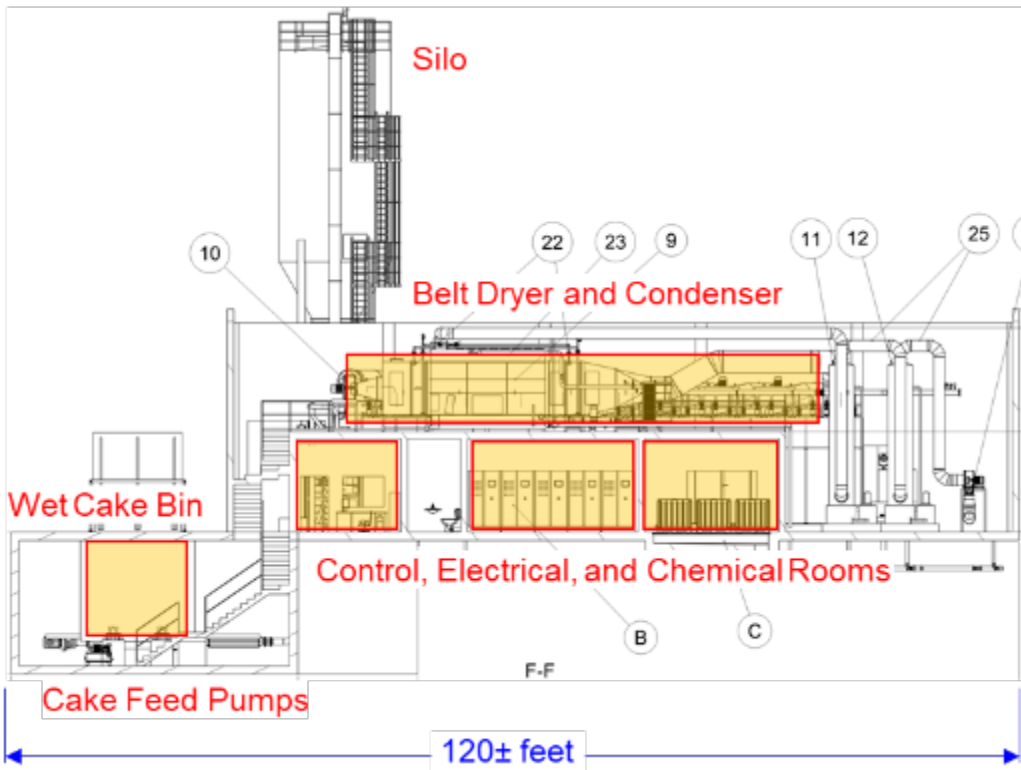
Drying Facility Conceptual Layout: Section View (Source: Huber)
